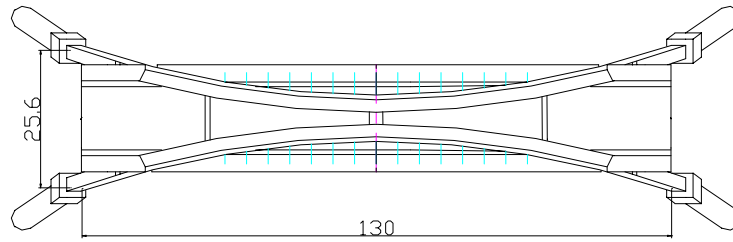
Horizontal plan of Xiaowan Arch Bridge(unit: m).
